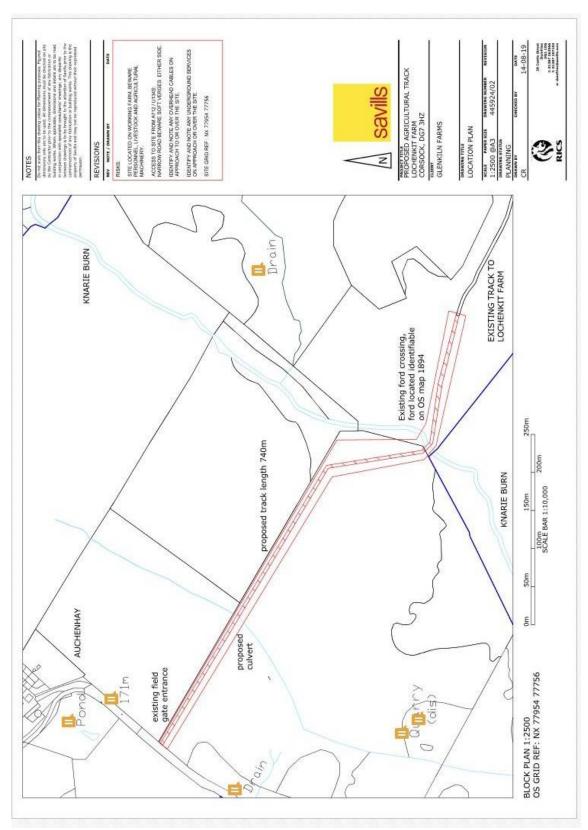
block plan showing the route of the proposed track (kindly provided by Savills)
